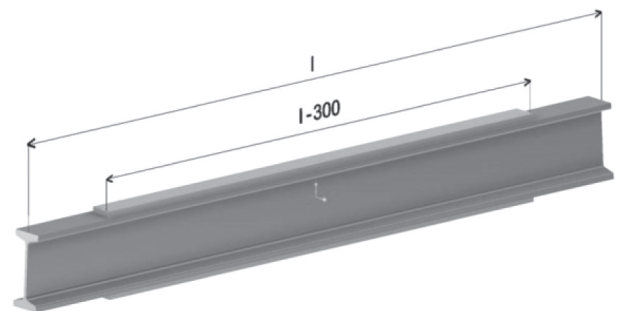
Rail 155 reinforced using flat bars welded to the outer surfaces of the lower and upper part
